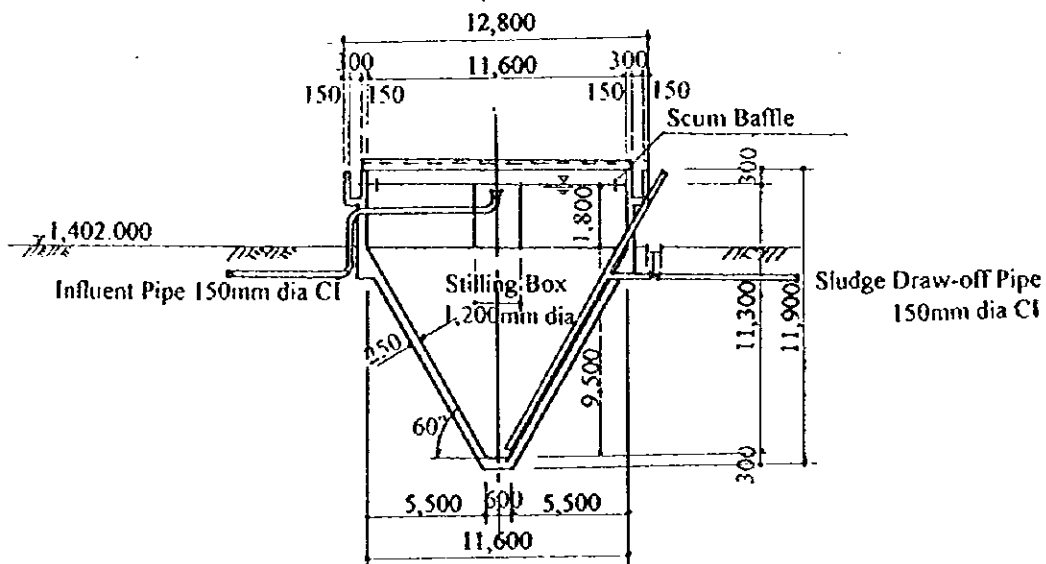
Final Sedimentation Tank Plan & Section S = 1/400
